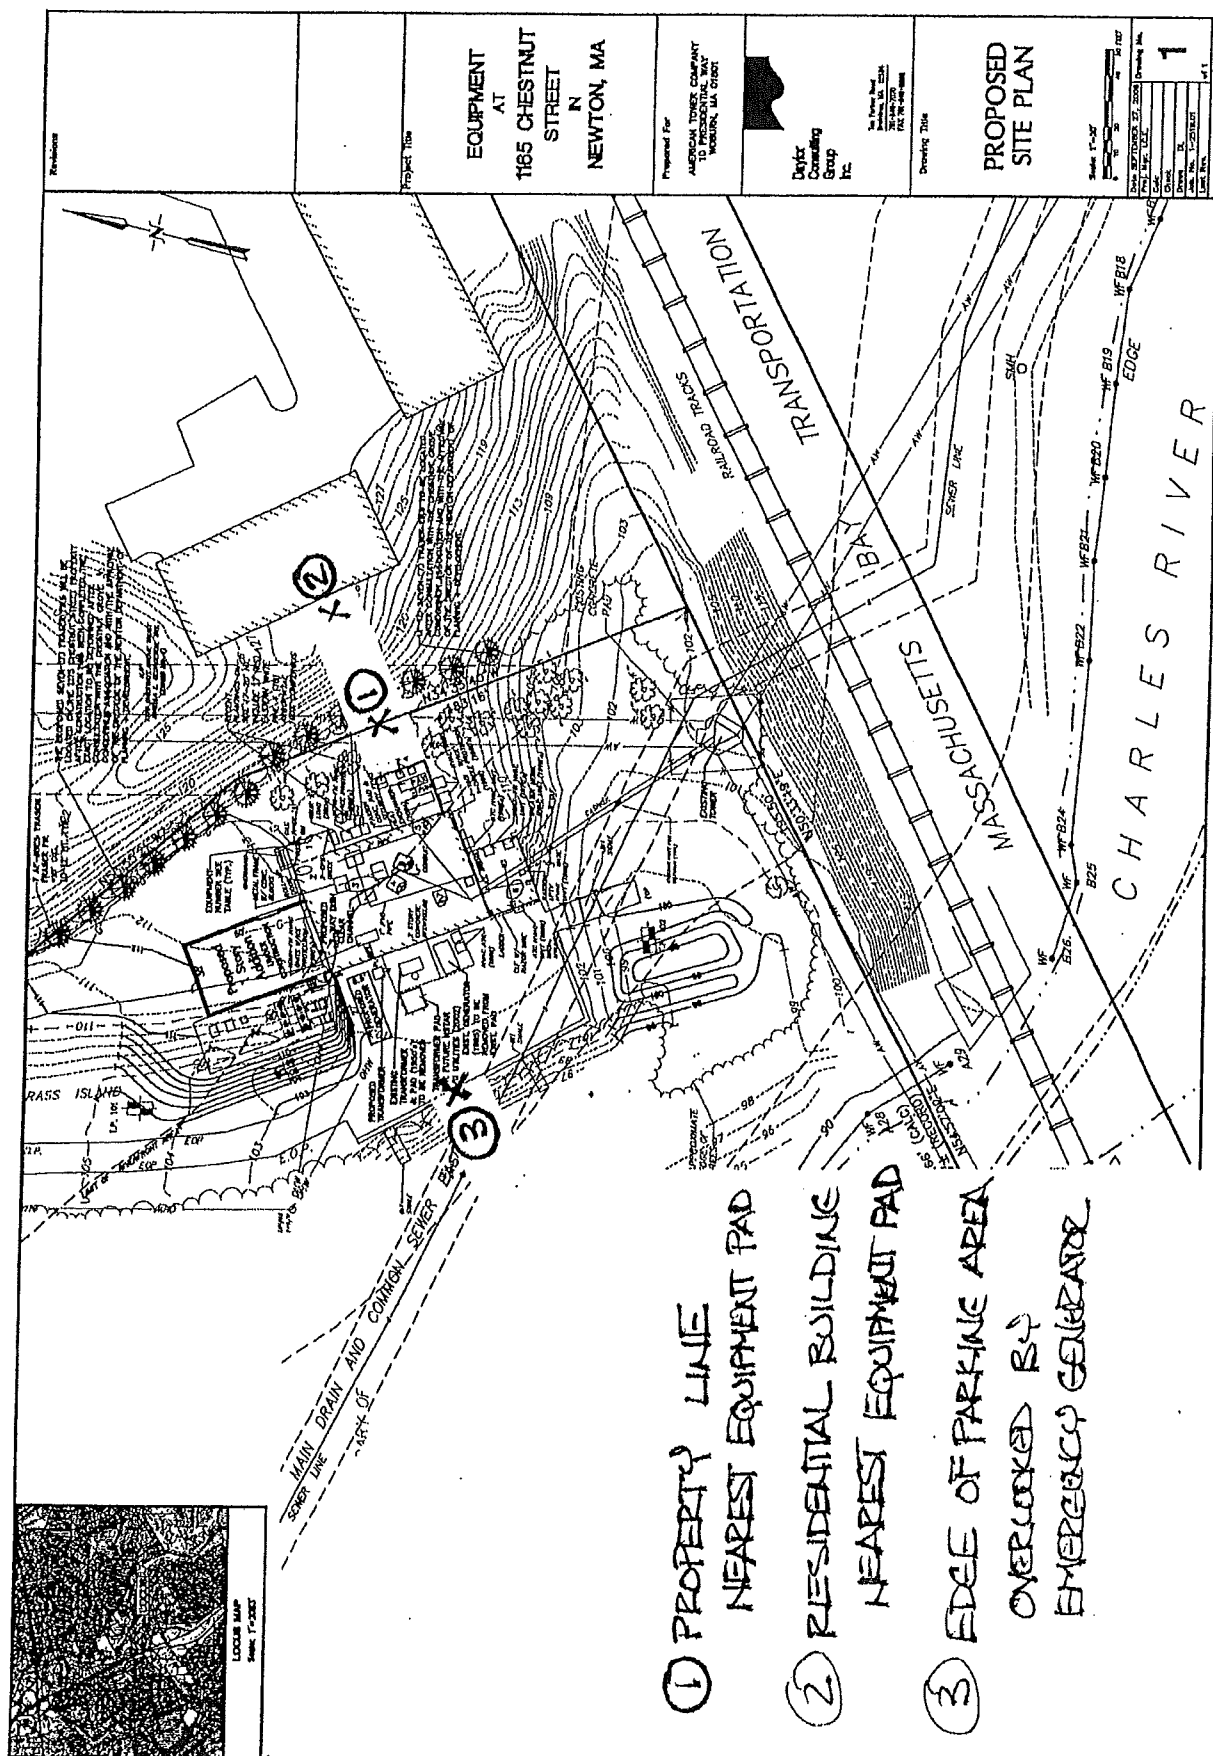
SITE PLAY SHOWING MEASUREMENT LOCATIONS
